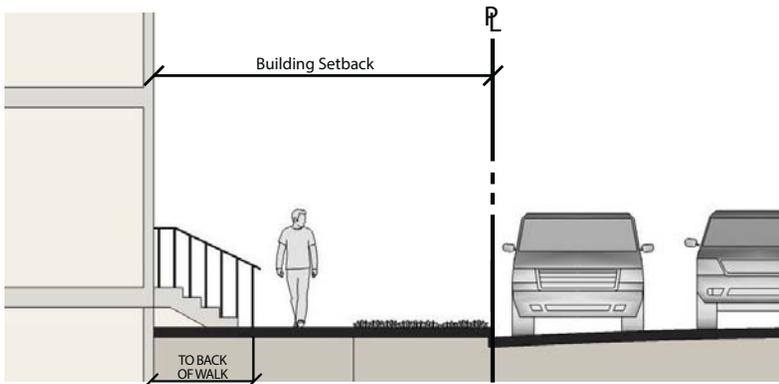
Neighborhood Street: Stairways, Front Stoops, & Ramps
